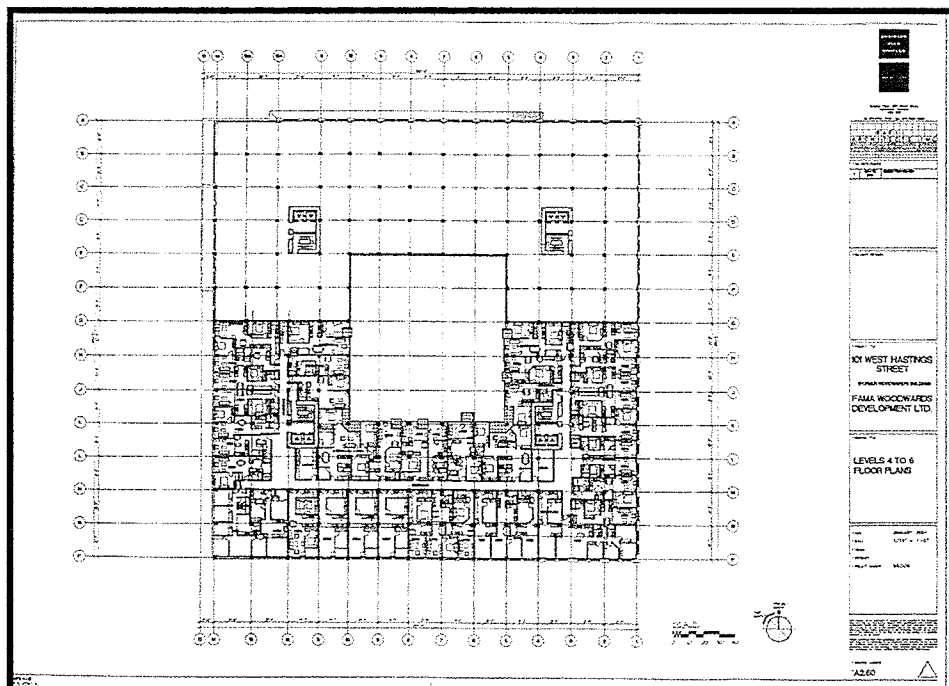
Proposed Level 4-6 Floor Plan compliments of Davidson, Yuen and Simpson
